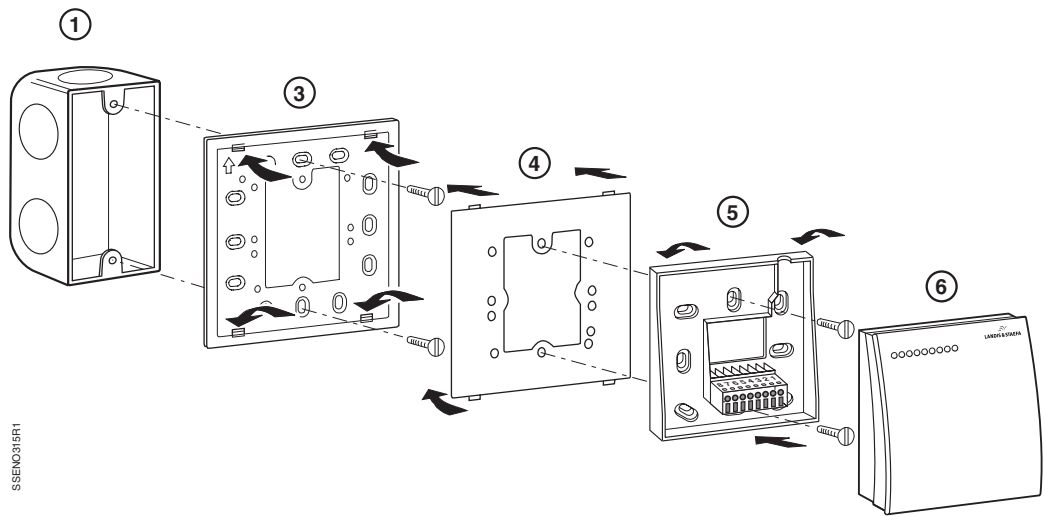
2 x 4-inch Electrical Wall Box Installation.
